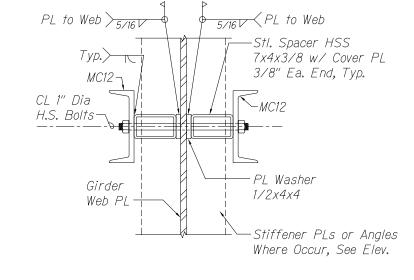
DETAIL NEW LONGITUDINAL STRUT AT BENT #1 \$ #3
